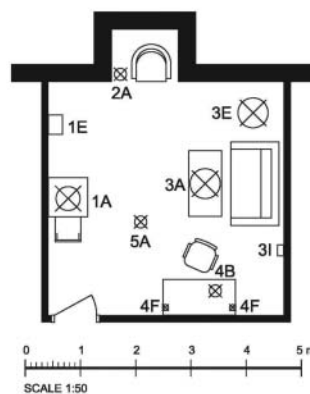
Coded floor plan, position of luminaries in Test room 1 and 2
